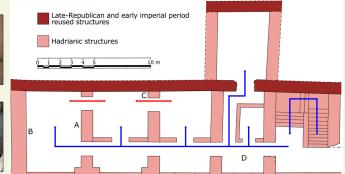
Reconstructive and schematic plan of the building in the Hadrianic period (first floor)
